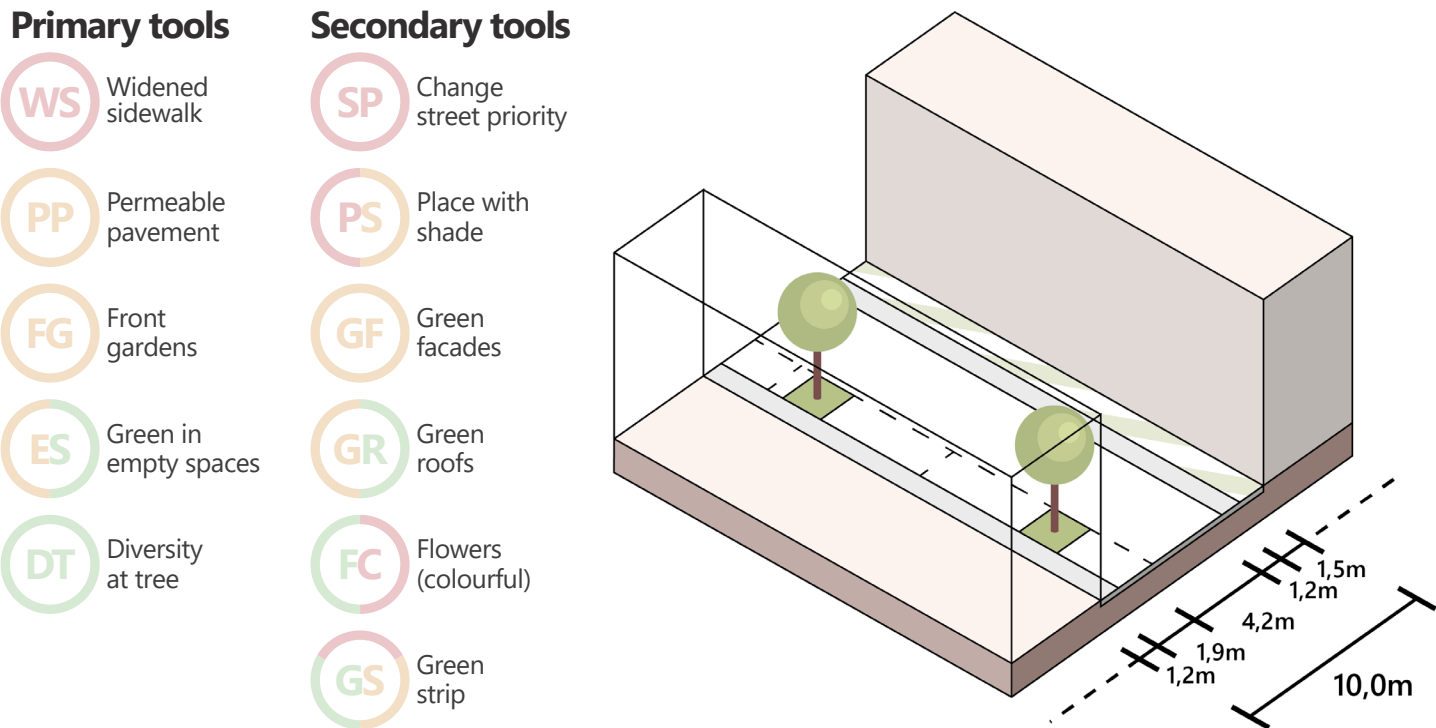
Axonometric street segment and potential interventions of type 5b. Made by Author.
